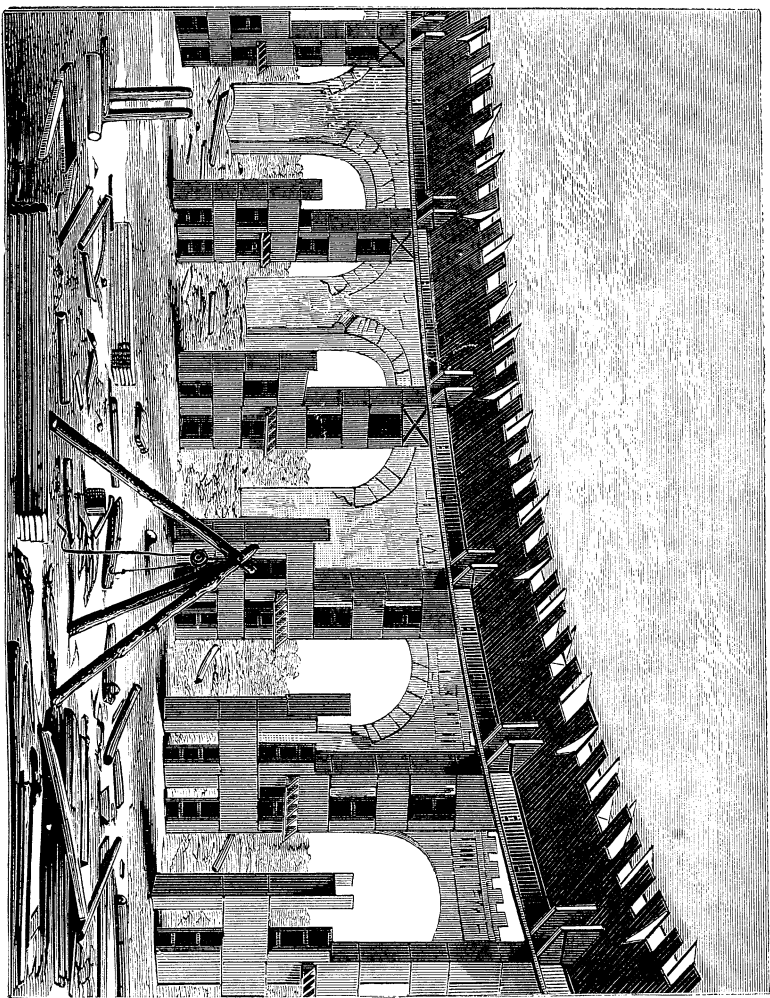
THE DOME-GIRDER PARTY RAISED.
